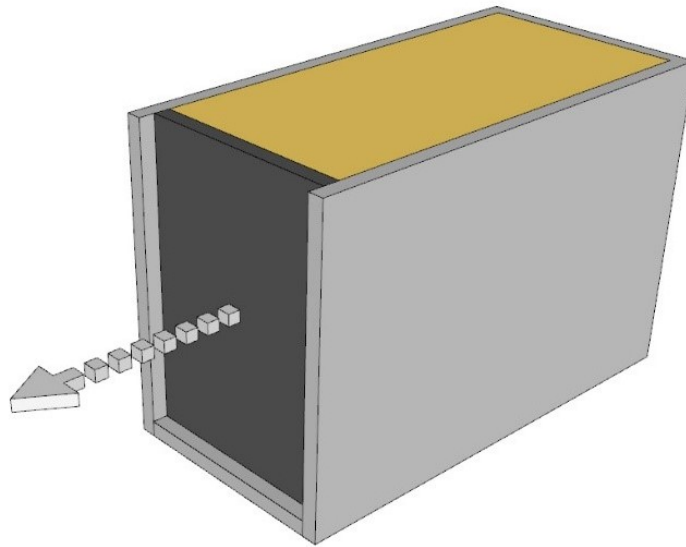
Graphical Illustration of Small Scale Retaining Wall Models Made Within the Scope of TUBITAK Project No. 114M329.
